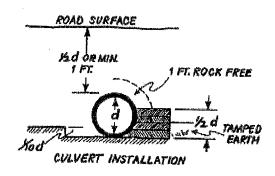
The elements of a properly installed ditch relief culvert. The culvert is angled at about 30 degrees to the road alignment to help capture flow and prevent culvert plugging or erosion of the inlet area. It is set at the base of the fill (ideally) or with a grade slightly steeper than the grade of the contributing cltch (but never with a grade less than 2 percent) (USDA-SCS, 1983). At a minimum, the grade of the ditch relief culvert should be sufficient to prevent sediment accumulation at the inlet or deposition within the culvert itself (it should be self-cleaning) (USDA-SCS, 1983).
